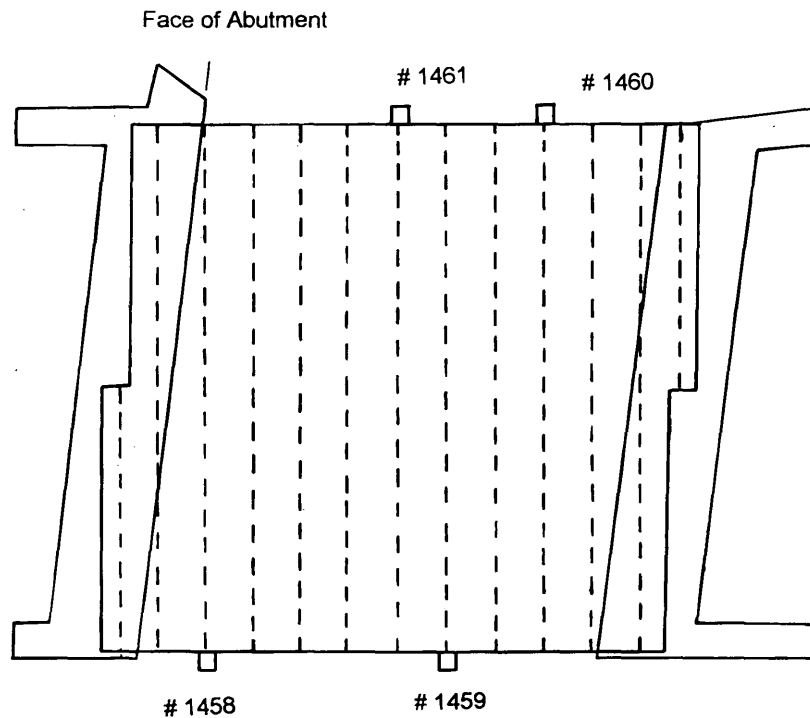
Plan view of bridge showing spacing of prestressing rods and location of load cells.
